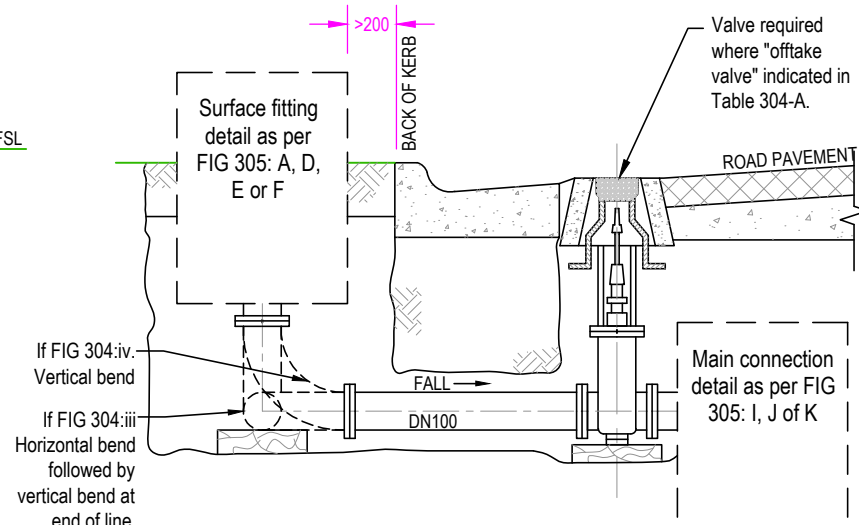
ii: SECTION VIEW. TYPICAL OFFSET ARRANGEMENTS
